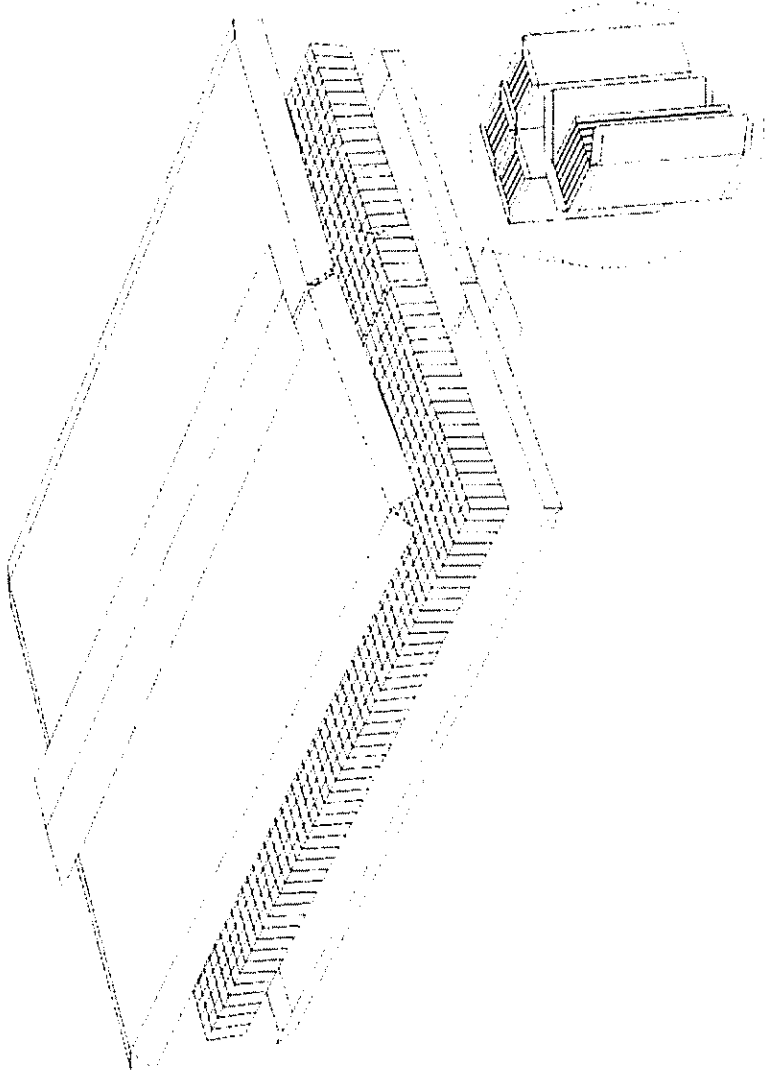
Schematic design: placement of bottom facesheet, wrapped cores and top facesheet. The splice plates are adhesively attached on-site.
